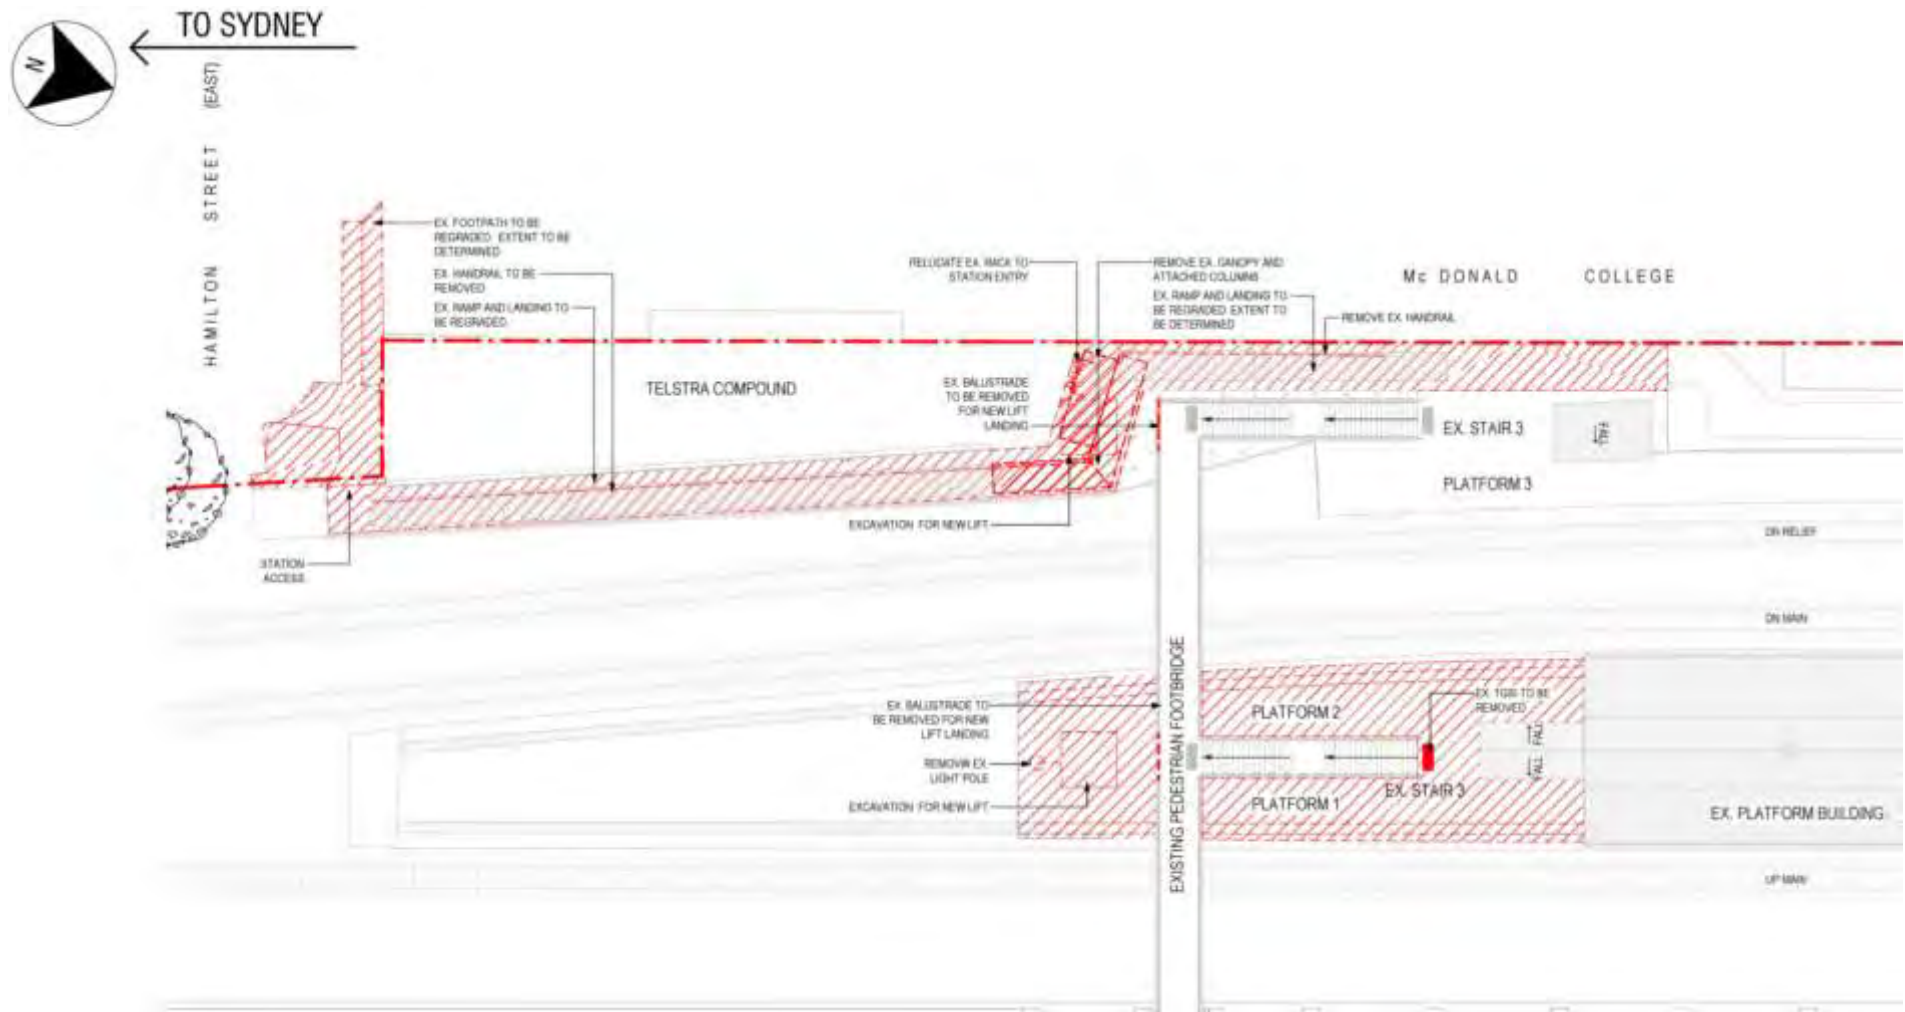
Plan indicating scope of demolition and excavation works (red shading) on the western approach to the Station – Works here relate to path widths, grades, canopies, balustrades and the excavations for the new lift. (Source: Transport for NSW)
